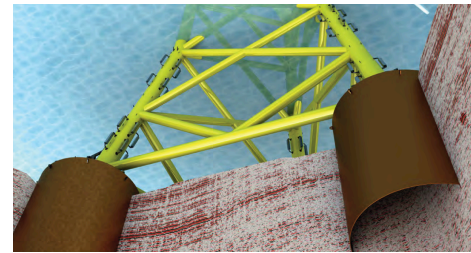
3DCP can be used with a variety of fixed and floating foundation types. Steel suction piles are used to anchor the support structure to the seabed to facilitate fast, quiet, reversible installations in a variety of U.S. installation sites.
